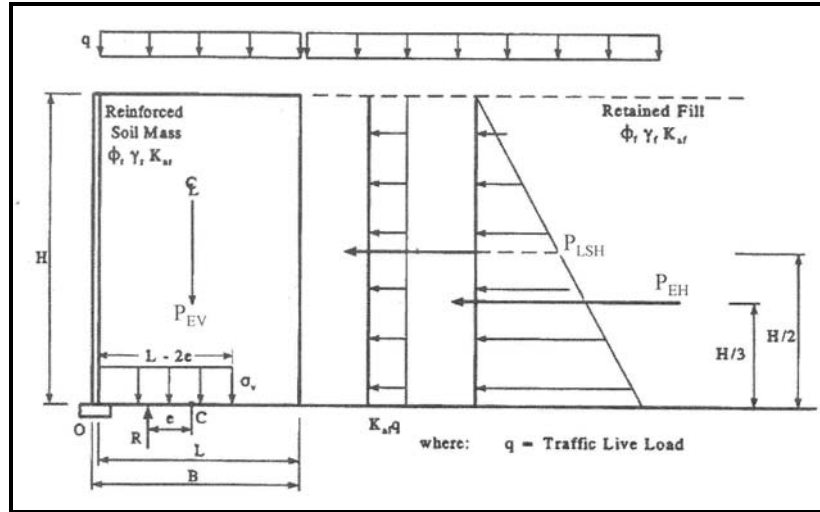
, MSE Wall Eccentricity for Horizontal Backslope With Traffic Surcharge (Earth Retaining Structures – June 2008)
